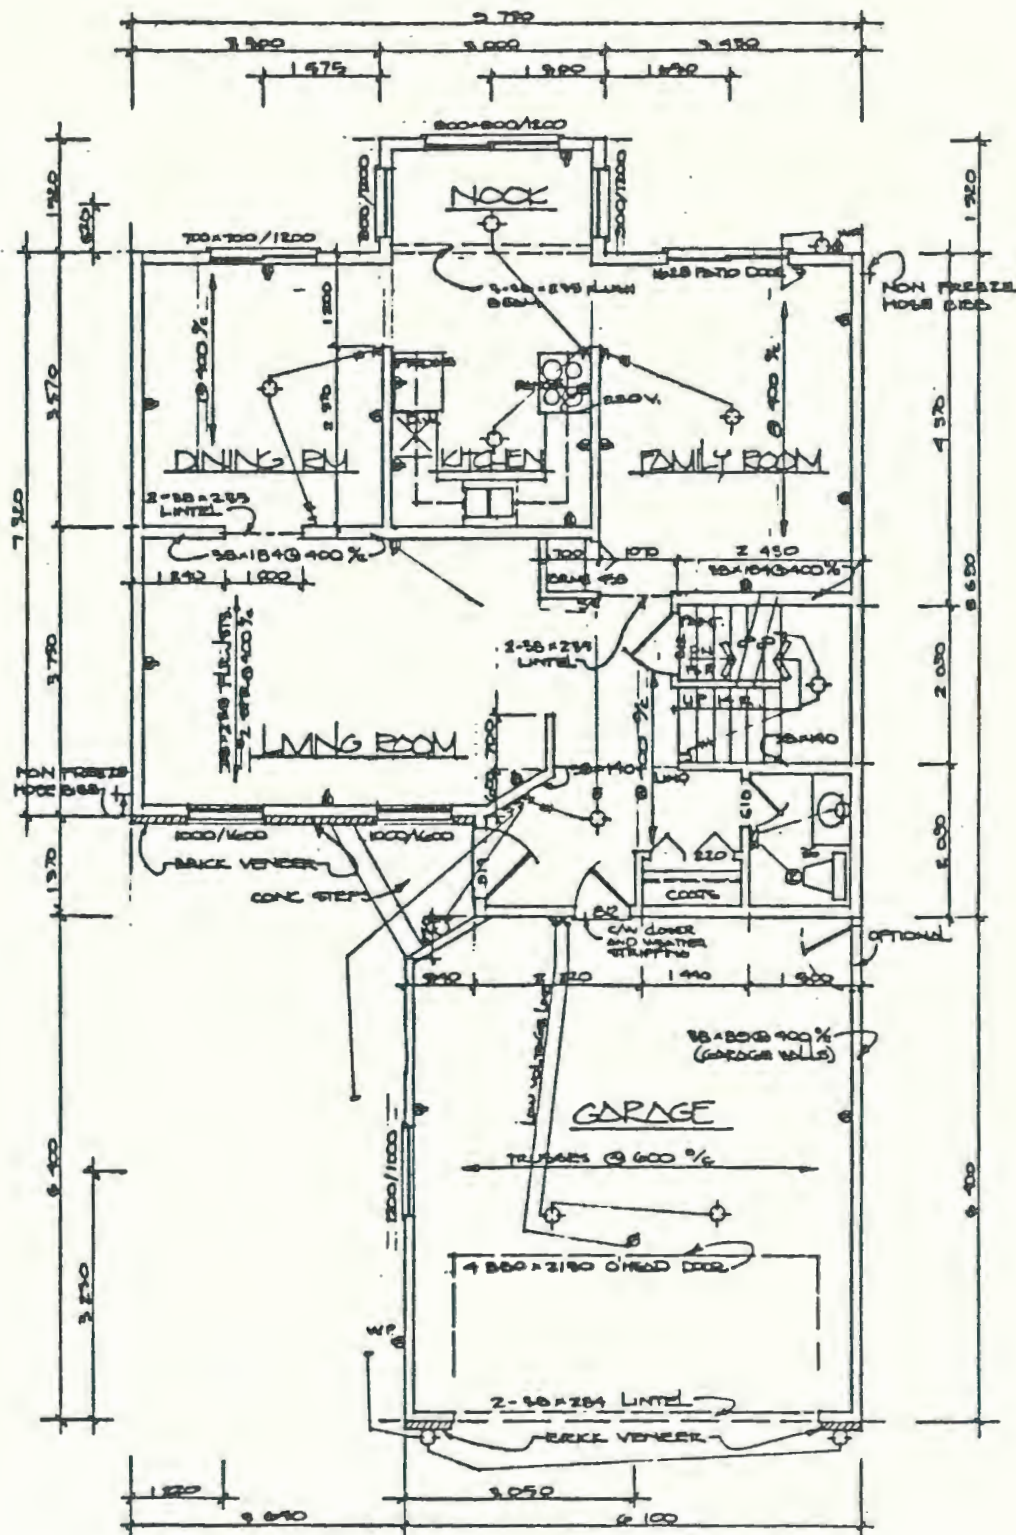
Main Floor Plan - Alberta Demonstration House
